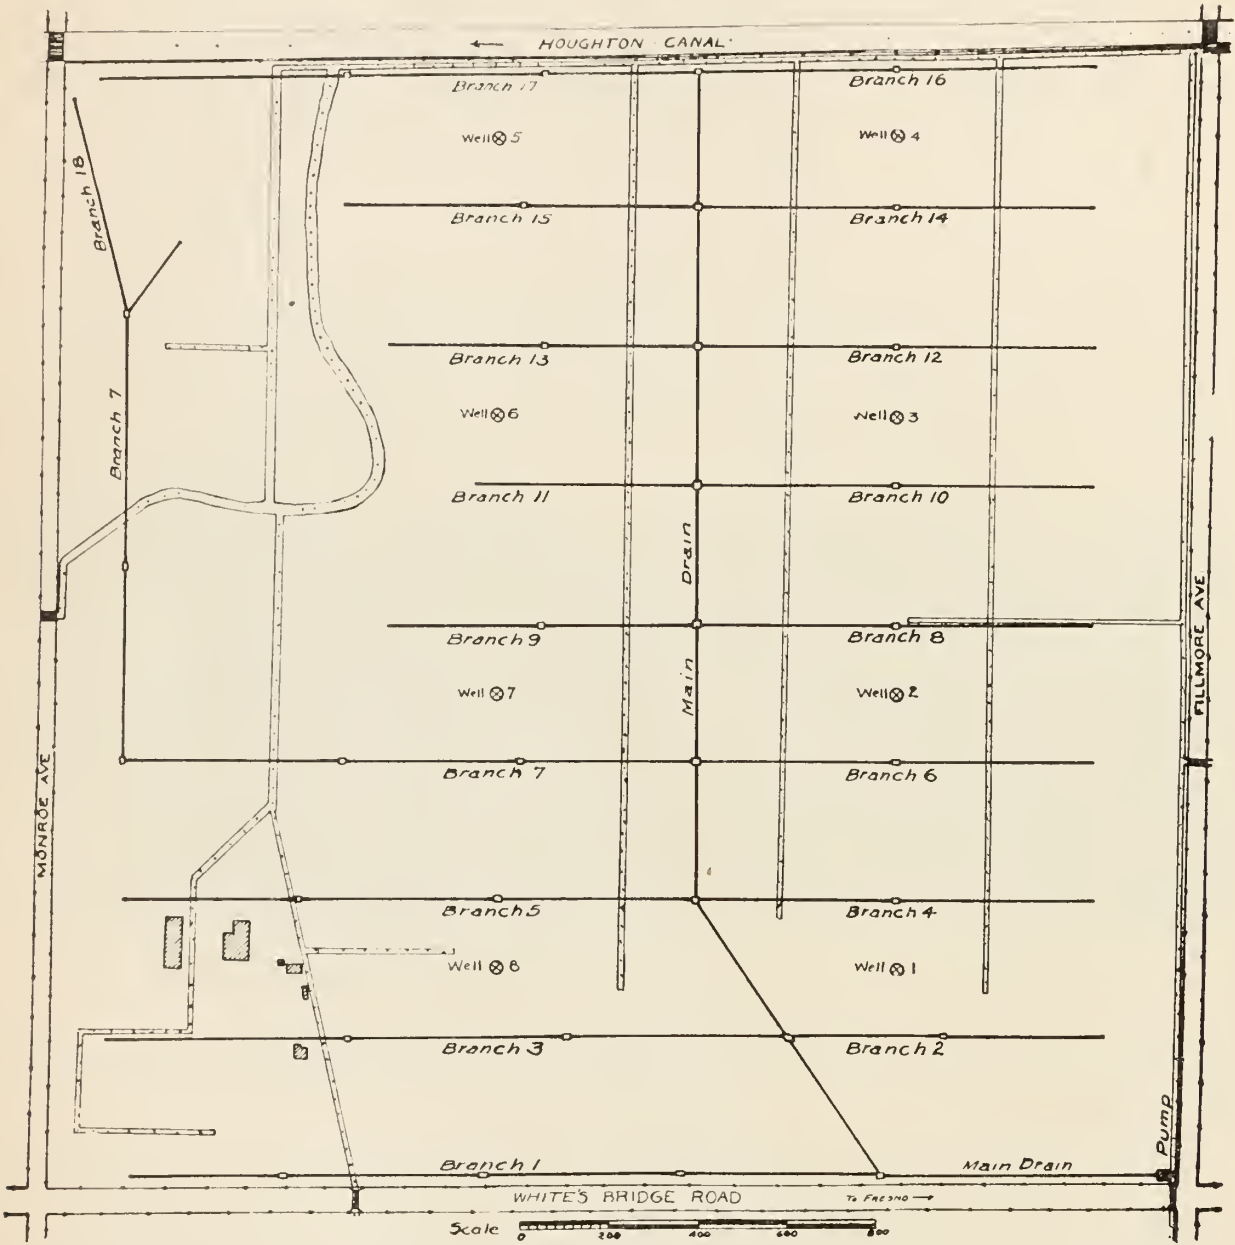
Sketch showing location of drains and test wells on Kearney Vineyard Experiment Drain.
